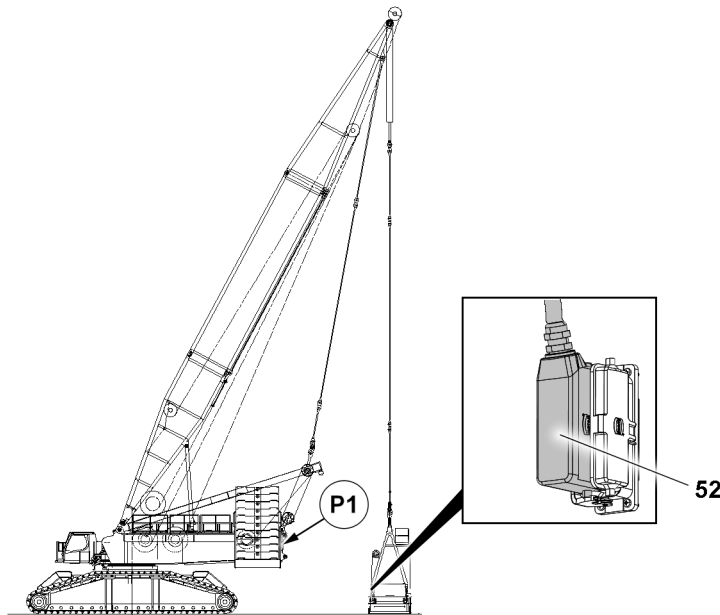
Establishing the electrical connection from the suspended ballast to the turntable
